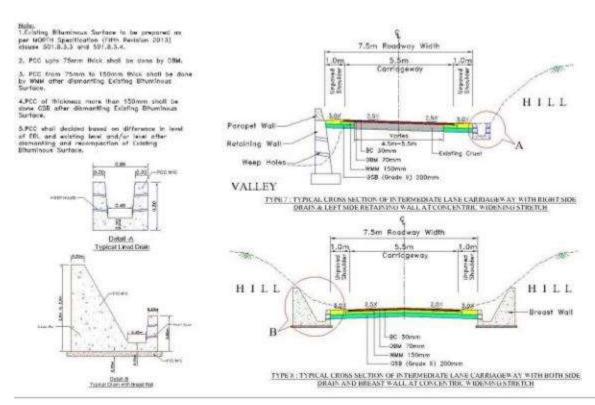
Typical Cross-Section of intermediate Lane carriageway with (Left/Right side Retaining wall and Breast wall) at concentric widening Stretch
